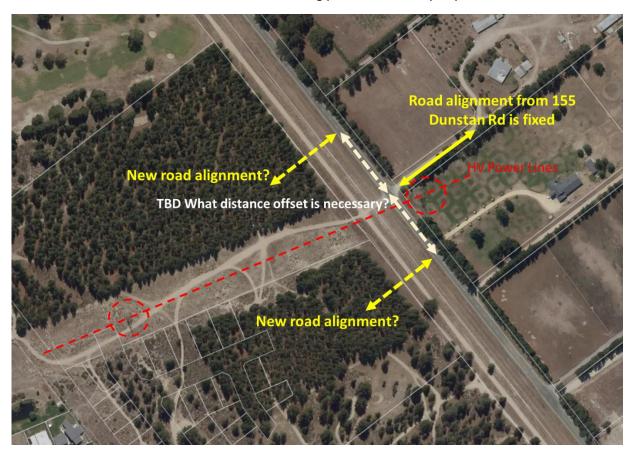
Illustration of intersection alignment and placement along Dunstan Road
